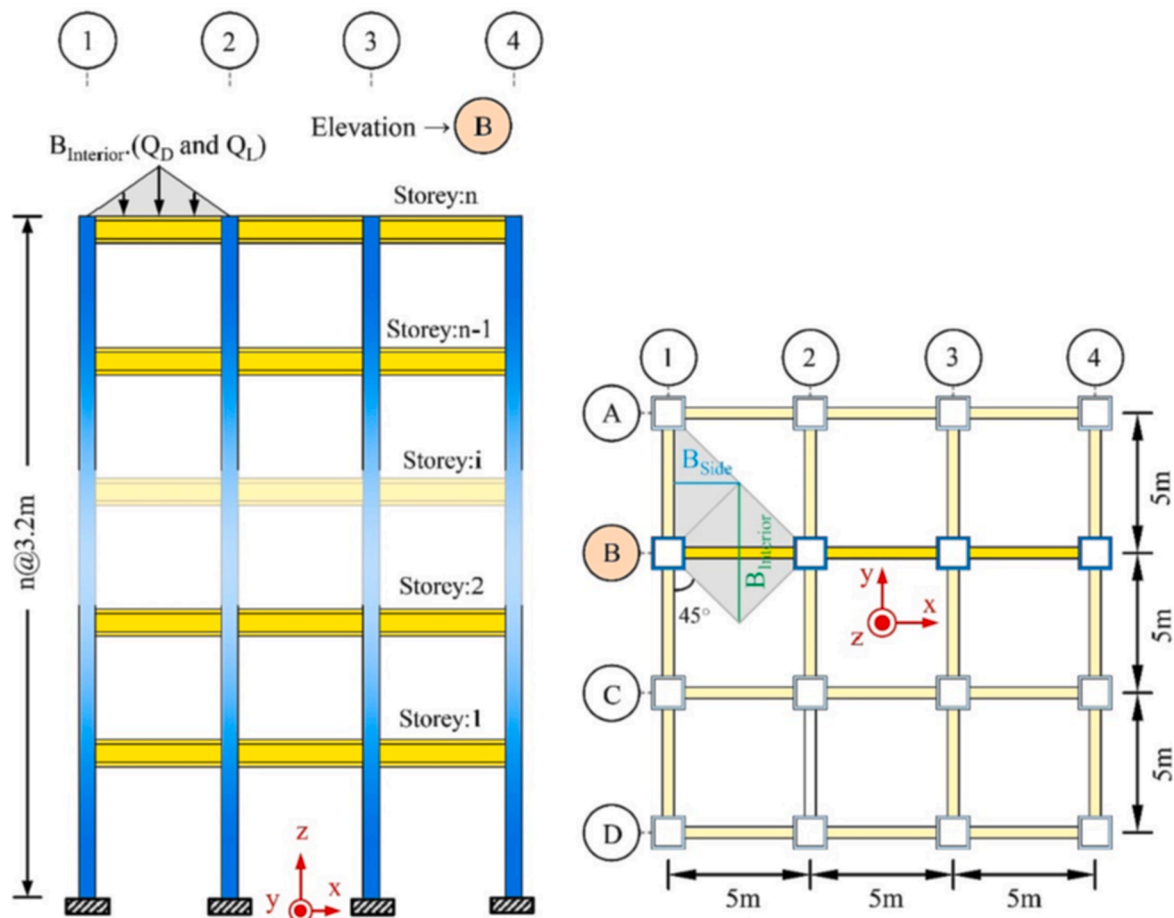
Schematic side elevation and plan of the structures, loading conditions and geometrical properties.
